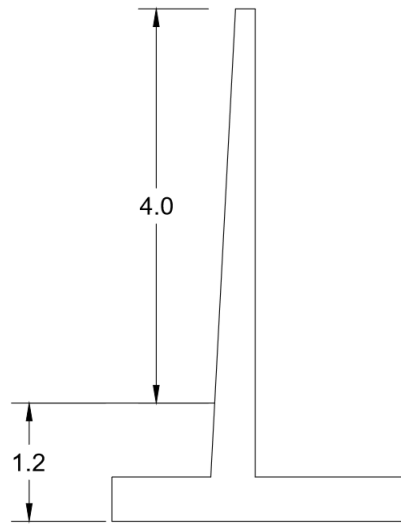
Cantilever retaining wall (Depth of foundation)
